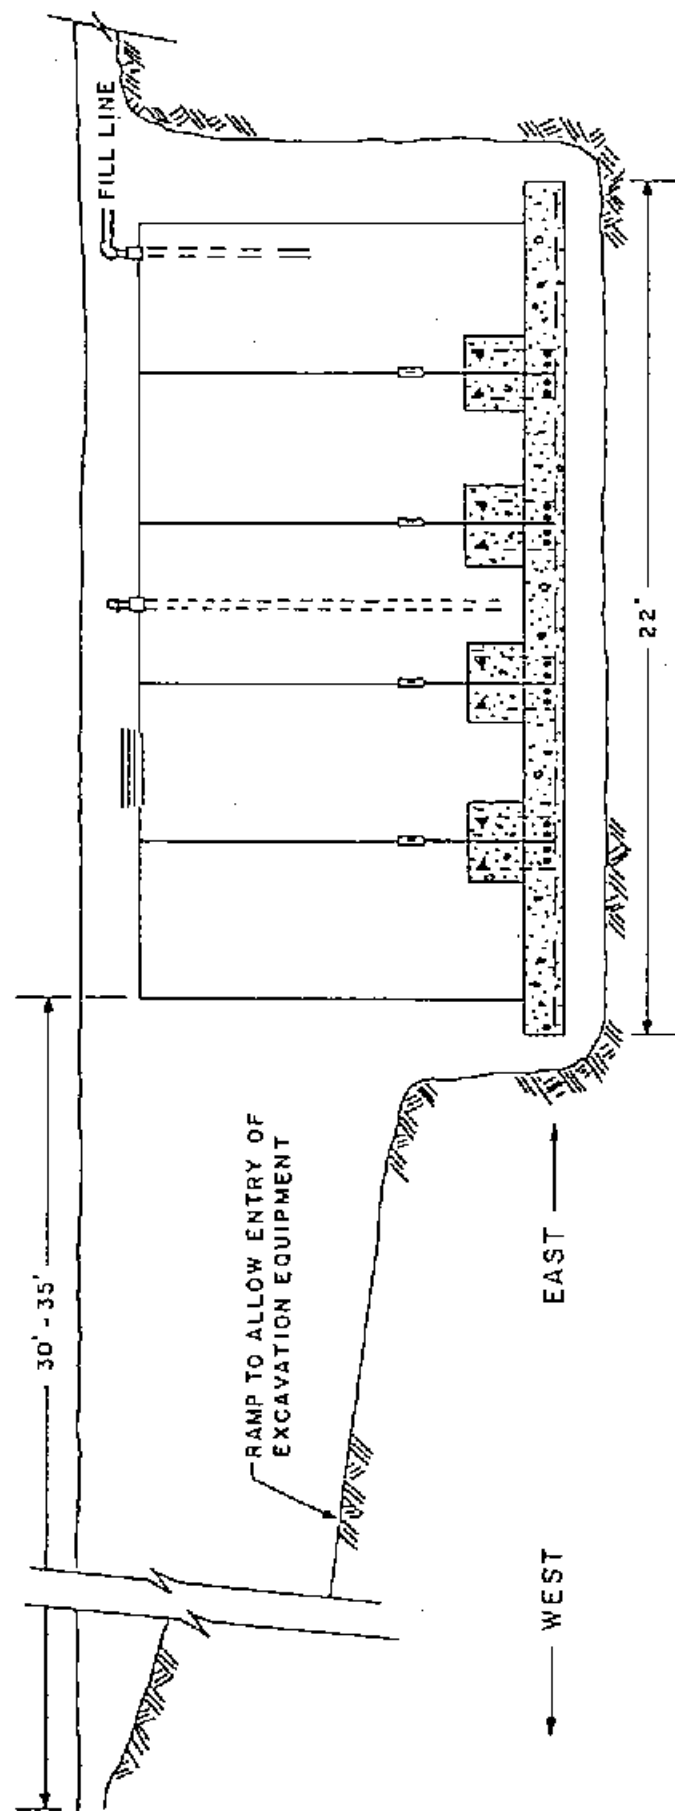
Longitudinal View of PCP Storage Tank Excavation
